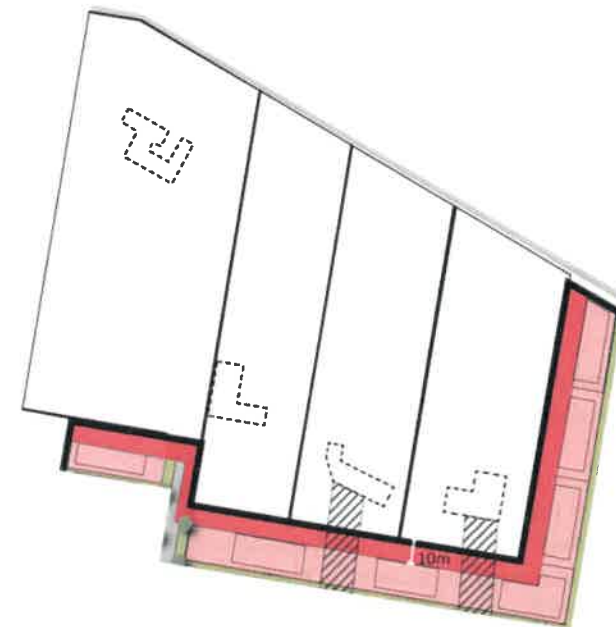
Lots adjoining the Residential Transition Area (source David Lock Associates)
